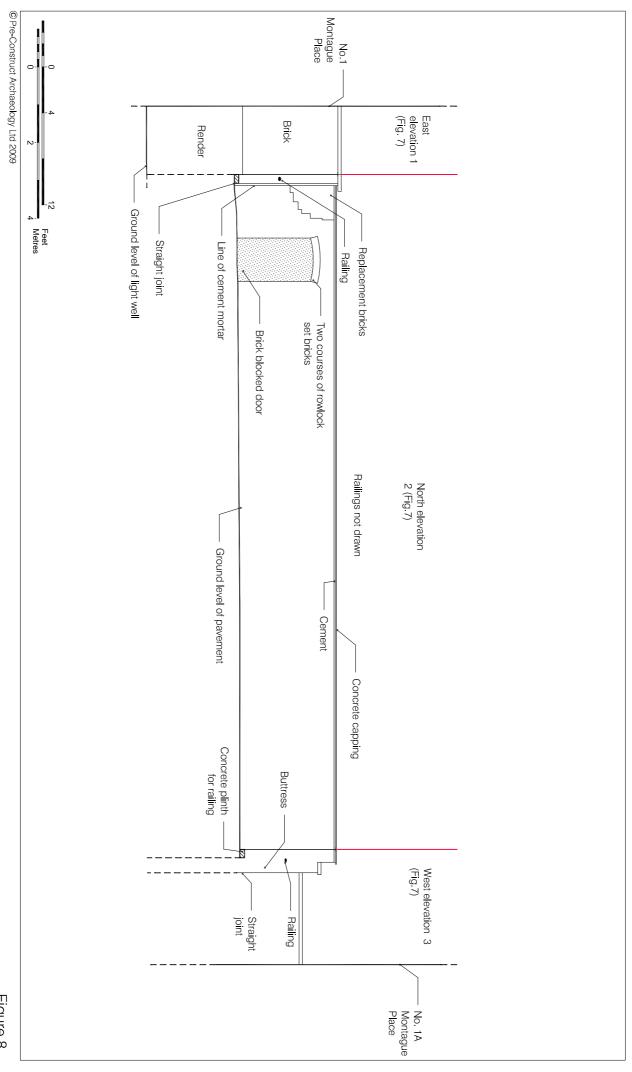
North, East and West Elevations Boundary Wall Montague Place, British Museum 1:100 at A4
